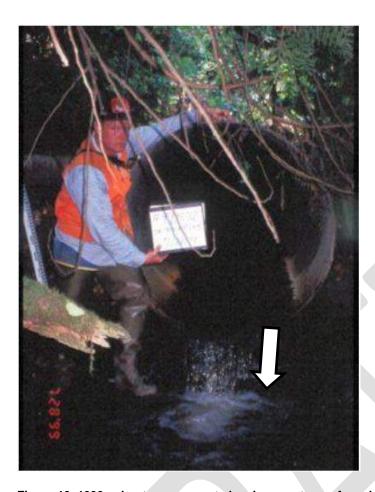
1999 culvert assessment showing a water surface drop at the outlet
